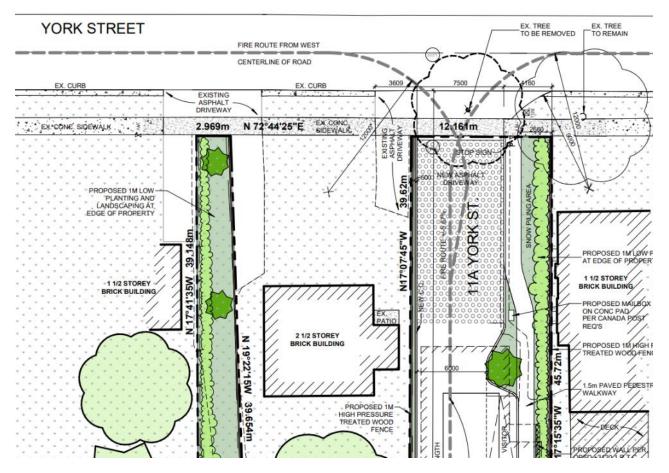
Excerpt from Landscape Plan showing updated plantings and mail-box area
